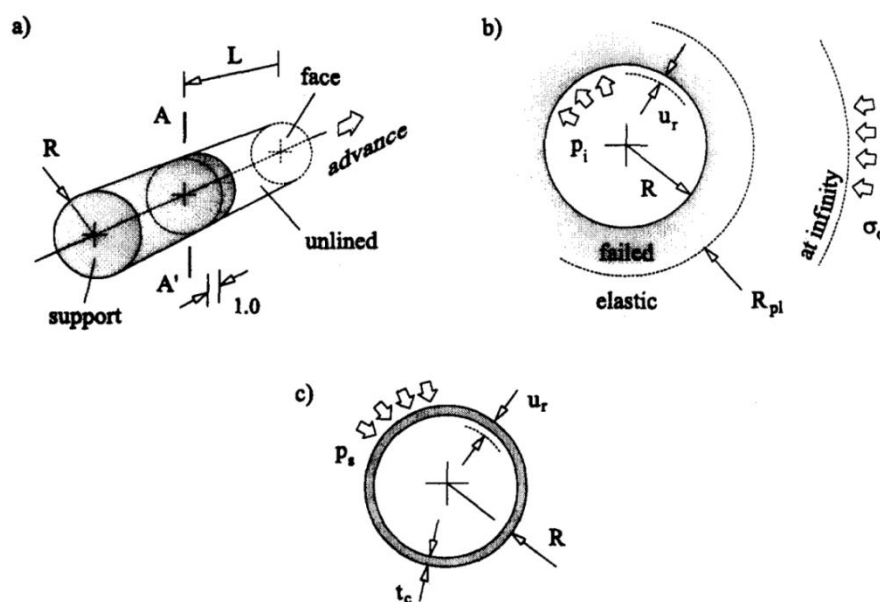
a) Cylindrical tunnel of radius R driven in the rock mass. b) Cross-section of the rock mass at the section A-A'. c) Cross-Section of the circular support installed at section A-A' (Carranza-Torres and Fairhurst, 2000).
